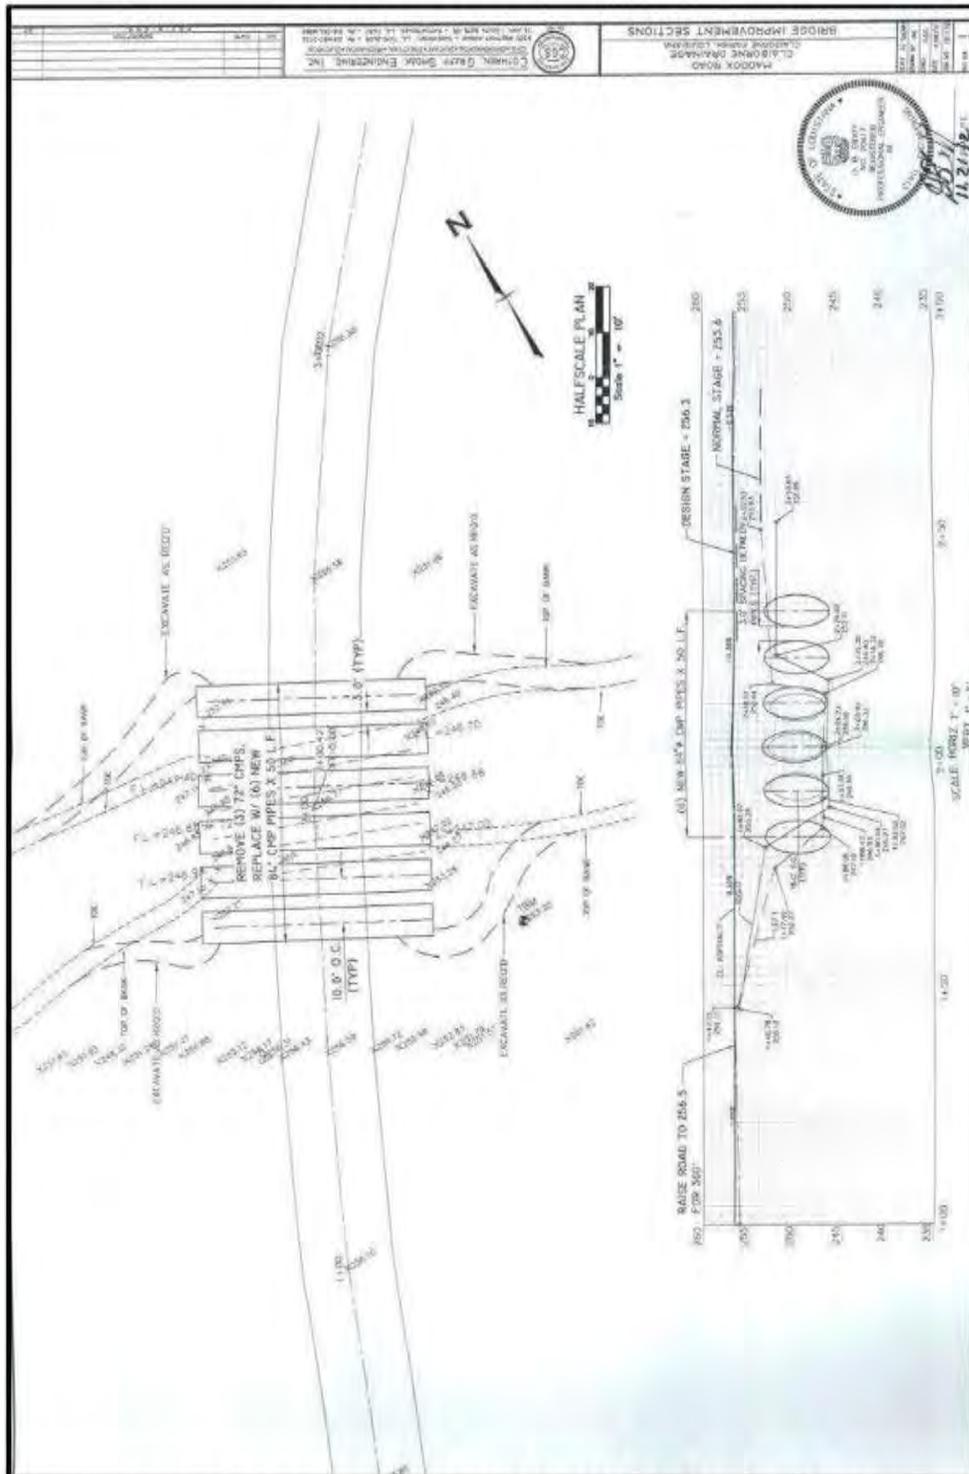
Construction plans for the proposed Maddox Road in PA 7 (Cothren, Graff, Smoak Engineering, Inc. 11/6/12).
